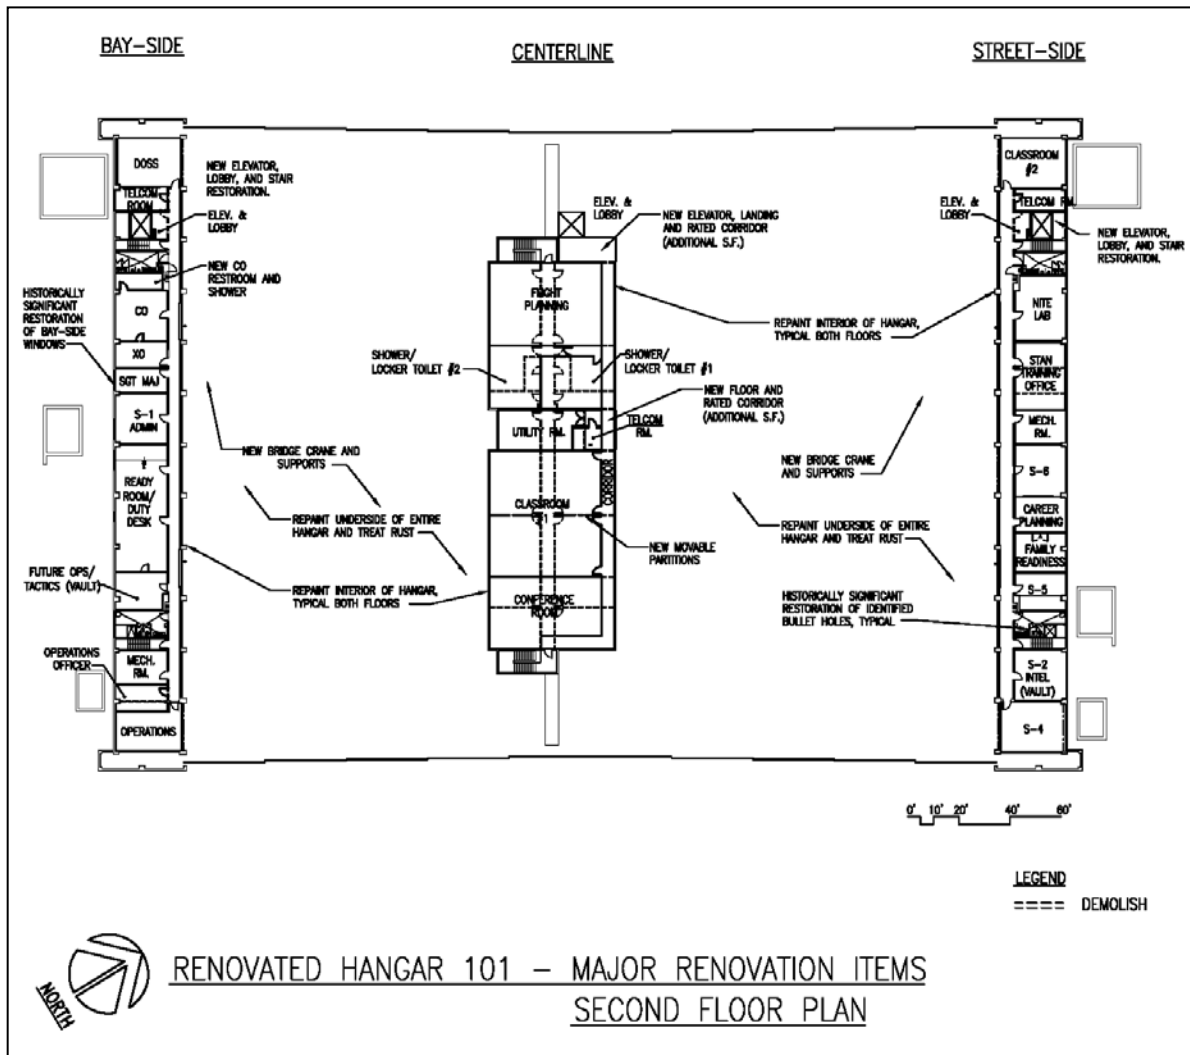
Proposed second floor renovation work for Hangar 1.
